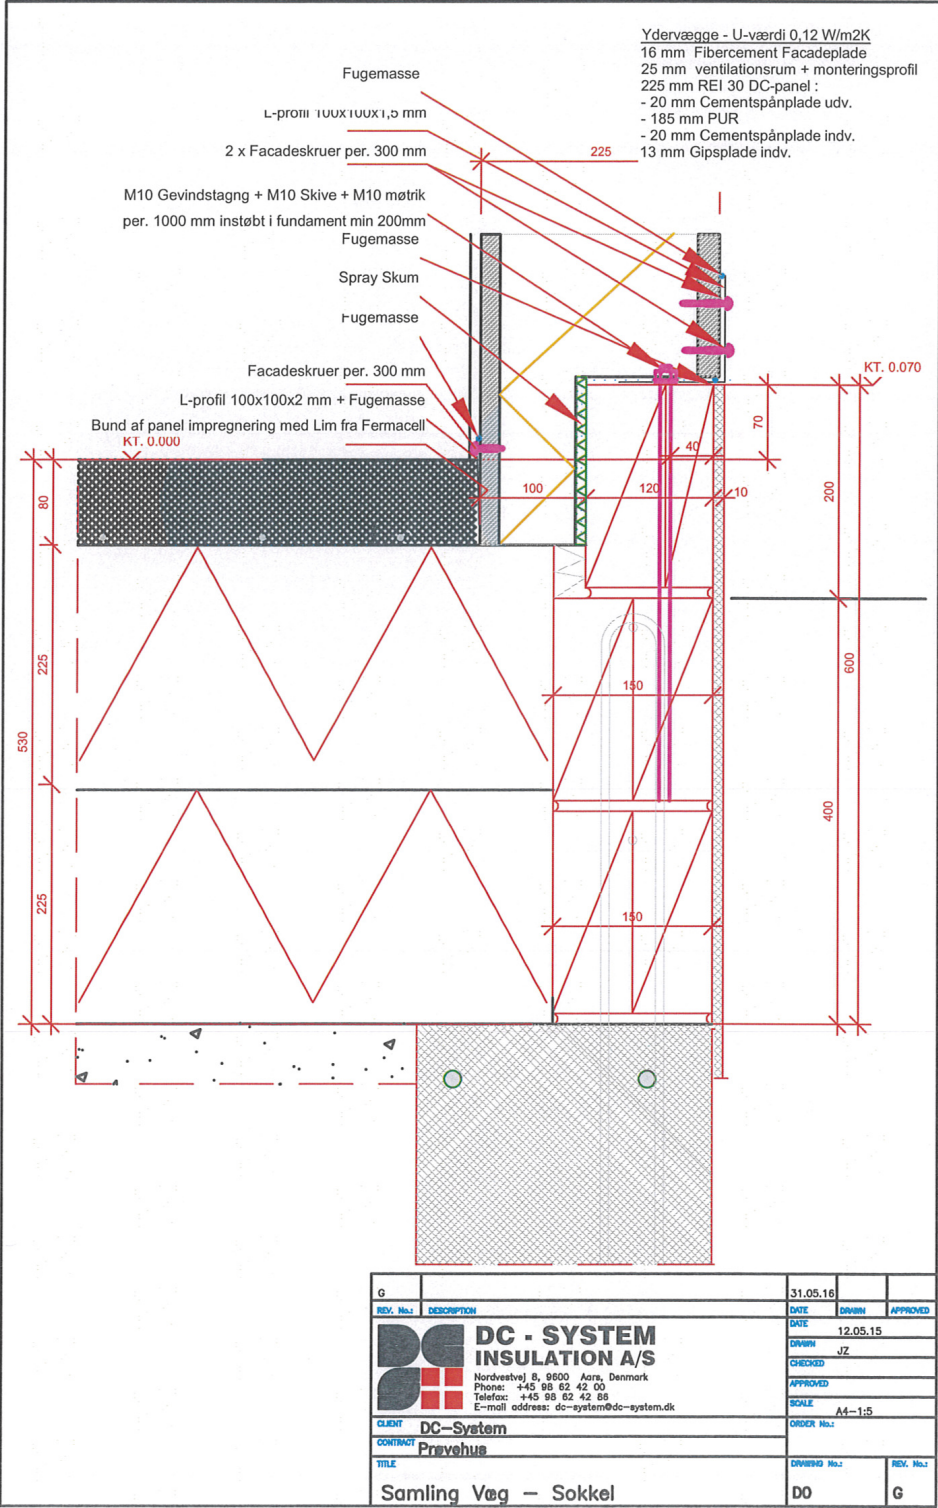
Detail: Wall-foundation. [DC-System, Test House (2015)]
